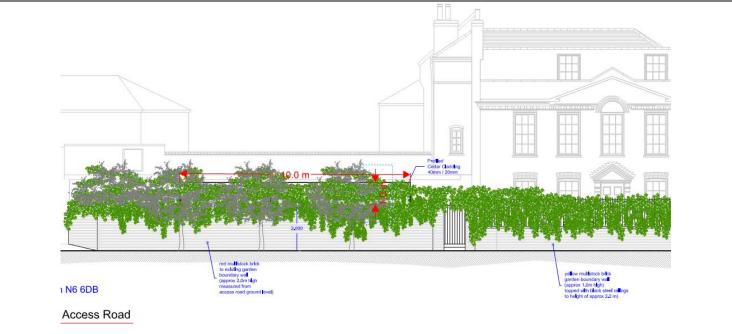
Proposed elevation AA showing outbuilding rising 1m over boundary wall for a length of 10m (indicated by red lines)
